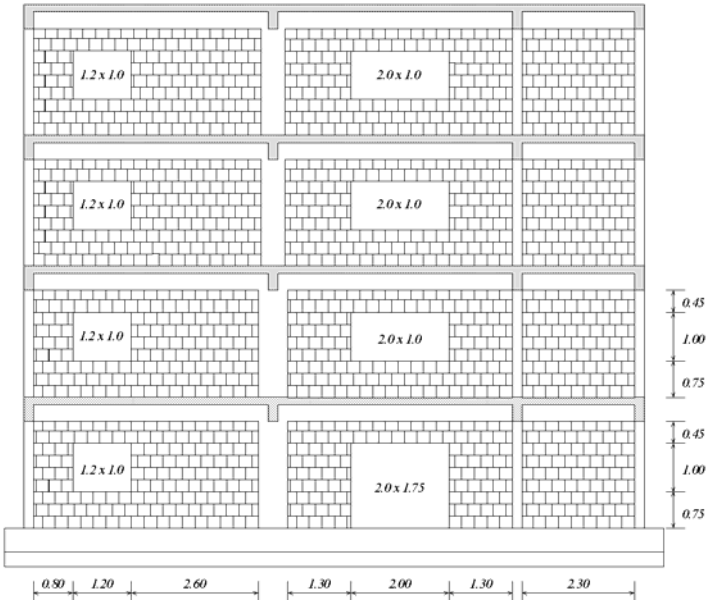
Elevation view of the infilled concrete frame (frame A): infill openings (location and dimensions)
